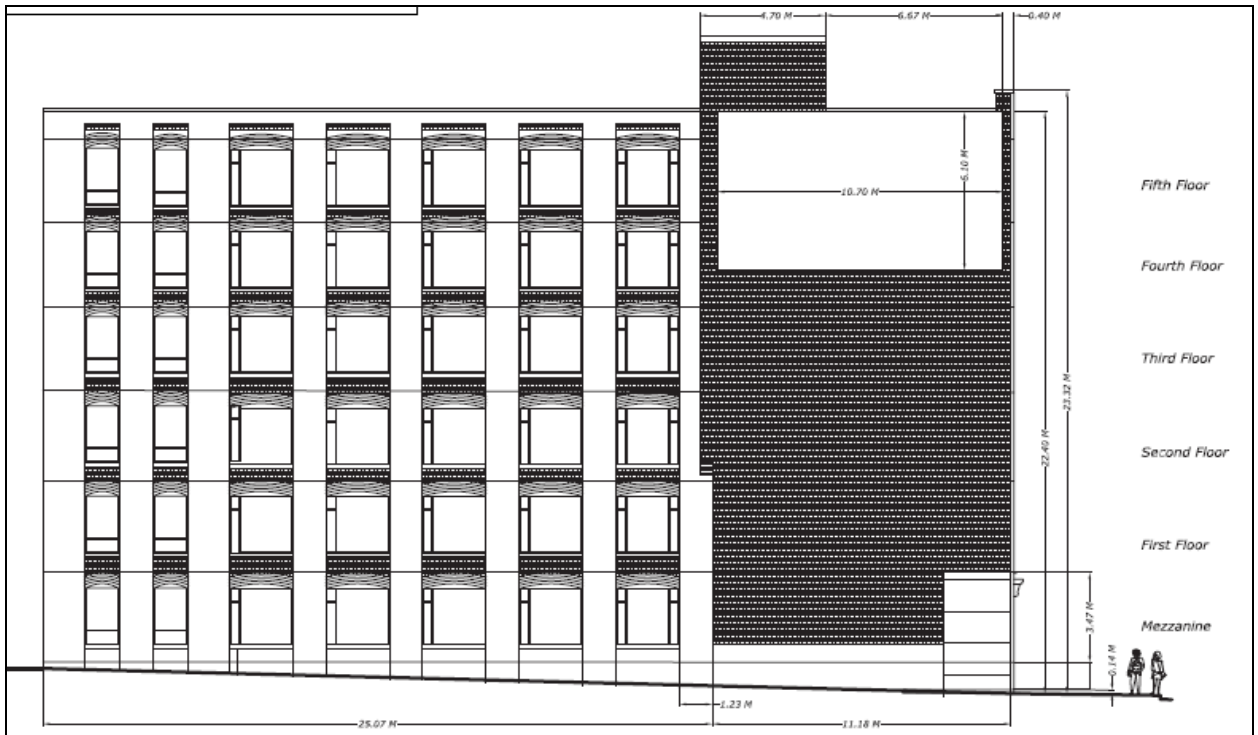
Sketch of Proposed Sign at 185 Spadina Avenue
